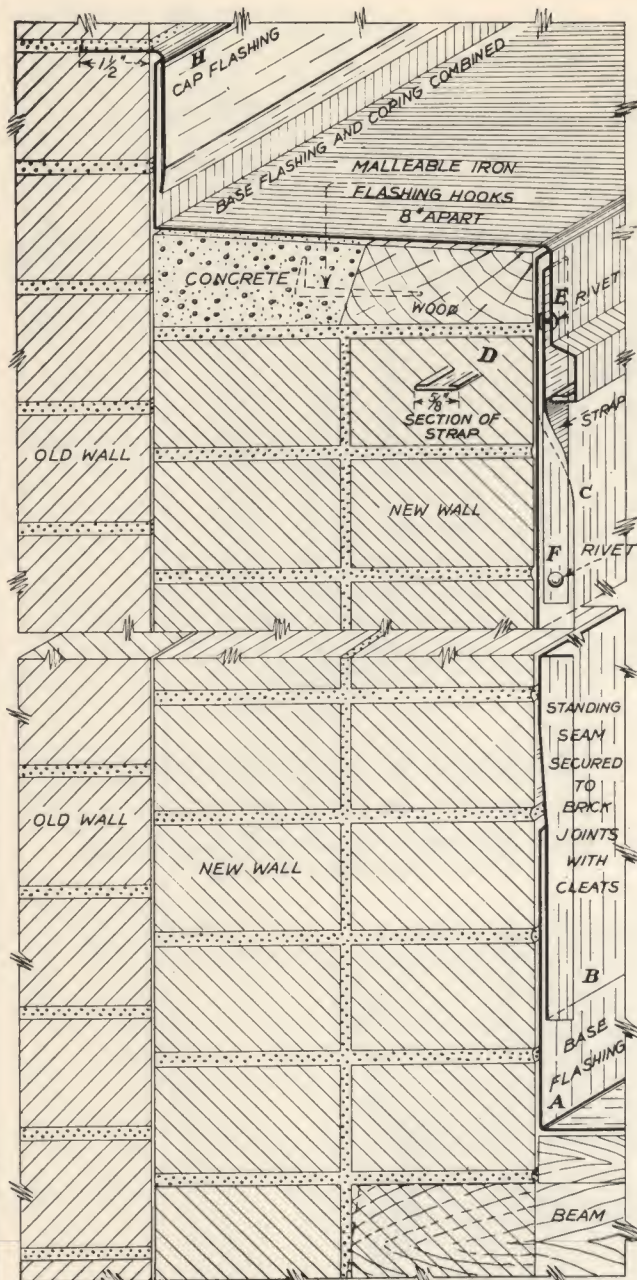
SHEET METAL COPING ON NEW WALL BELOW
